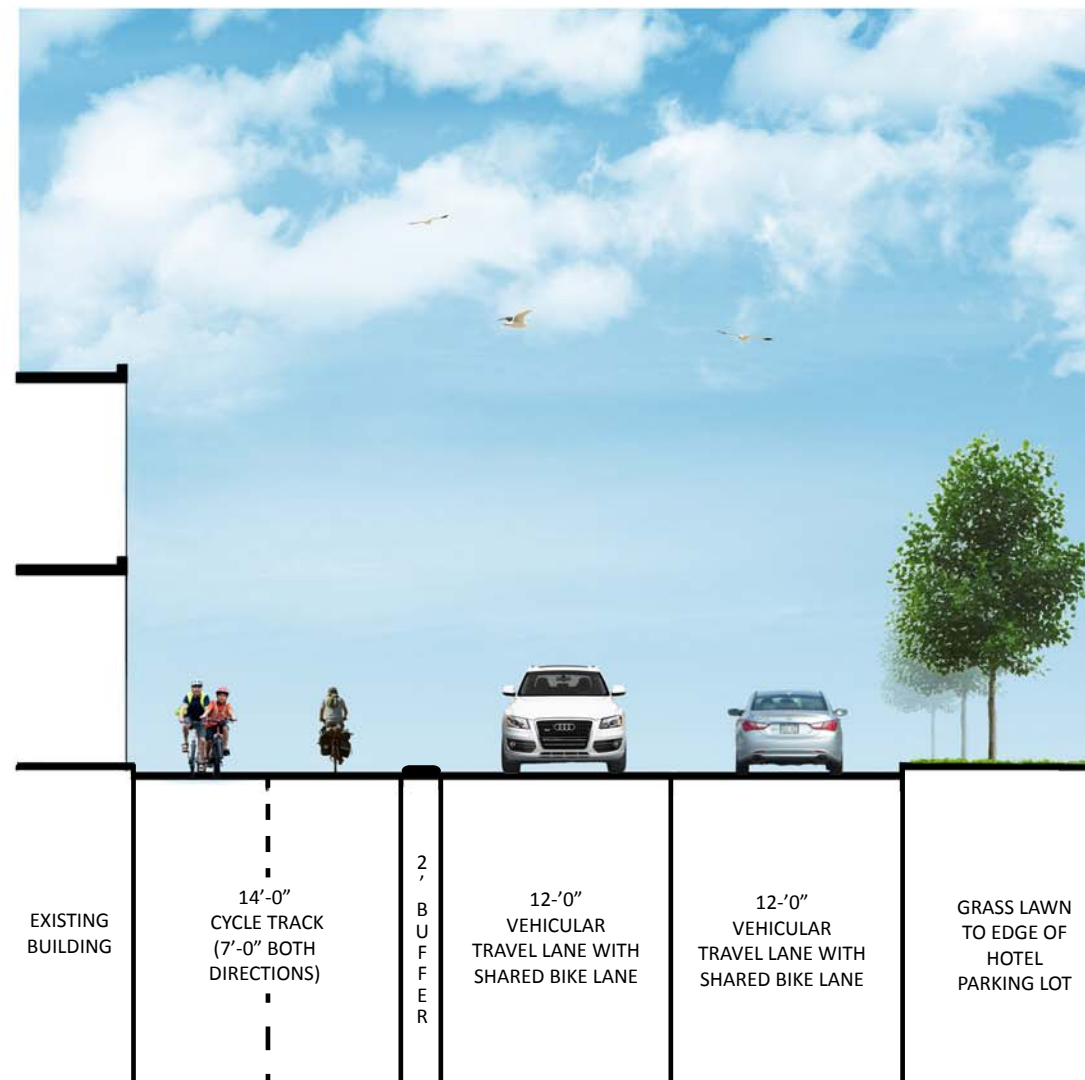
Section D1-D2: Street Type-Lee Avenue Connector
